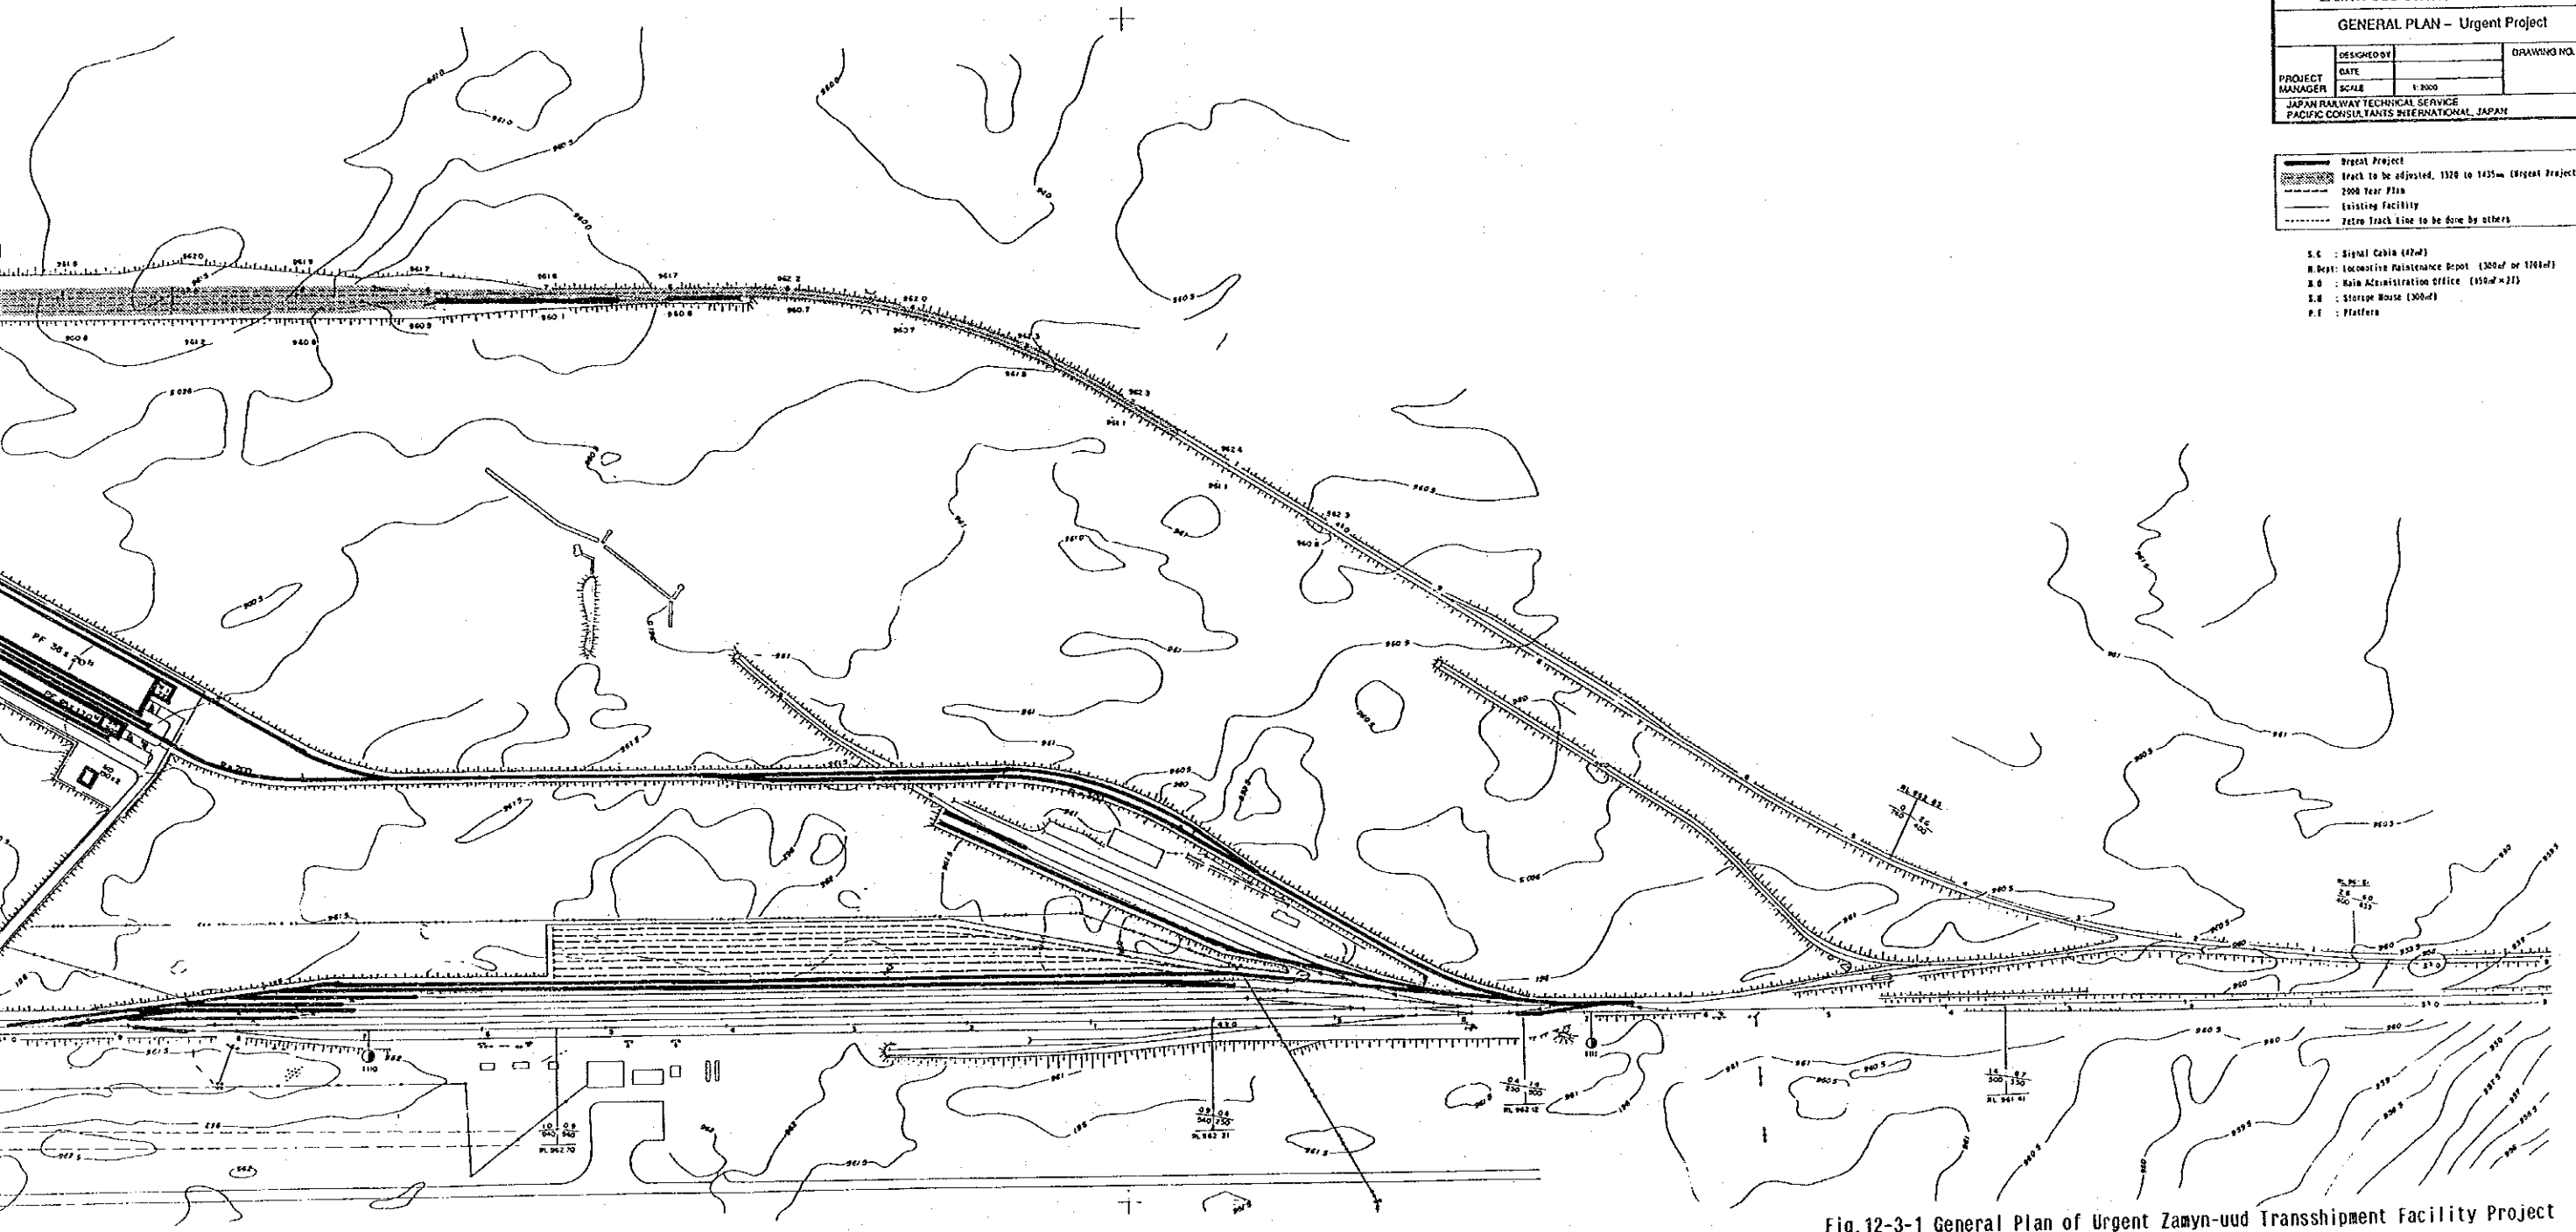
General Plan of Urgent Zamyn-uud Transshipment Facility Project
